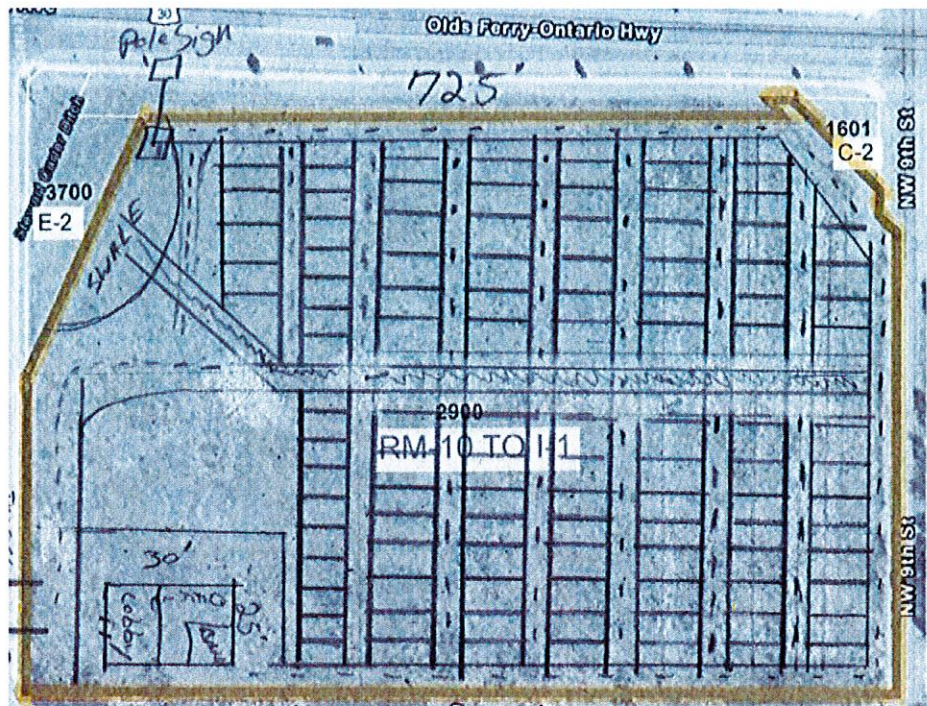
Rough Site Plan for Proposed Indoor Storage Units
